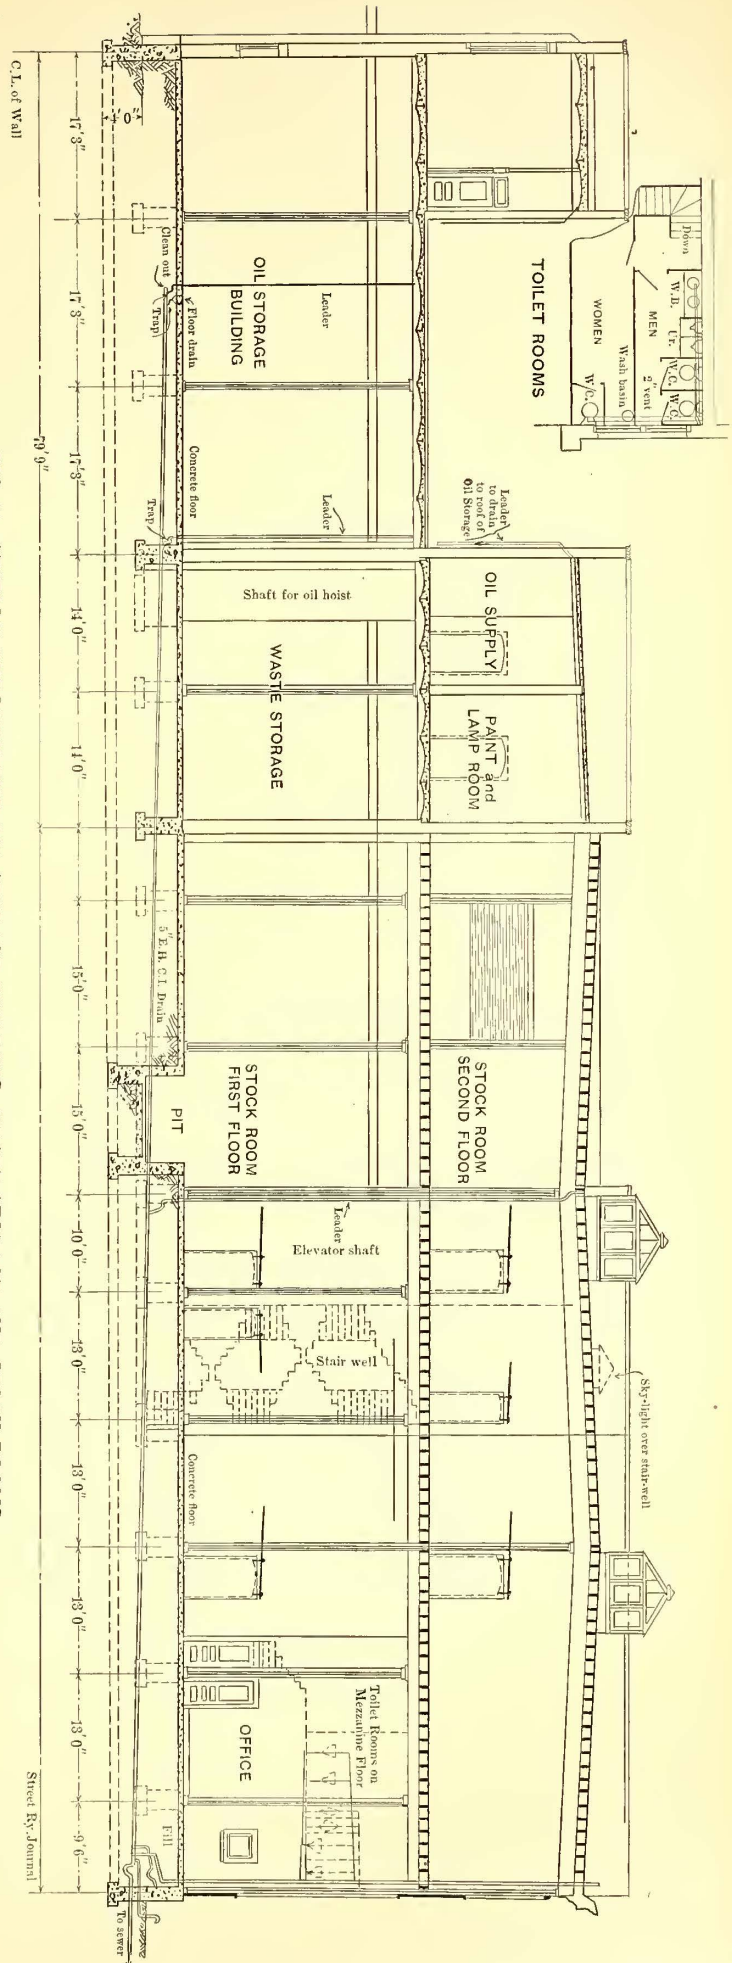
SECTION THROUGH THE OIL STORAGE BUILDING, WASTE STORAGE AND STOCK ROOMS
